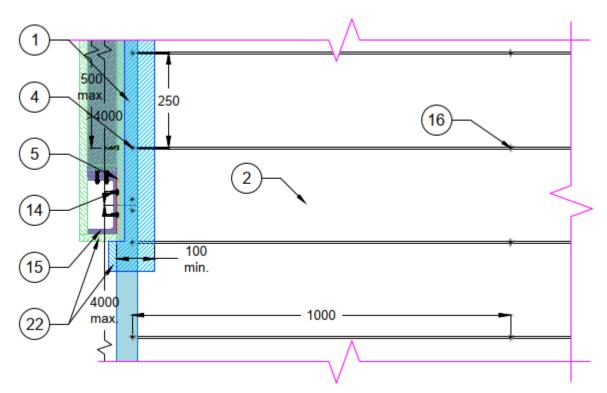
Protected steel beam and dropper perpendicular to spine wall – option 2 (section A-A) view
